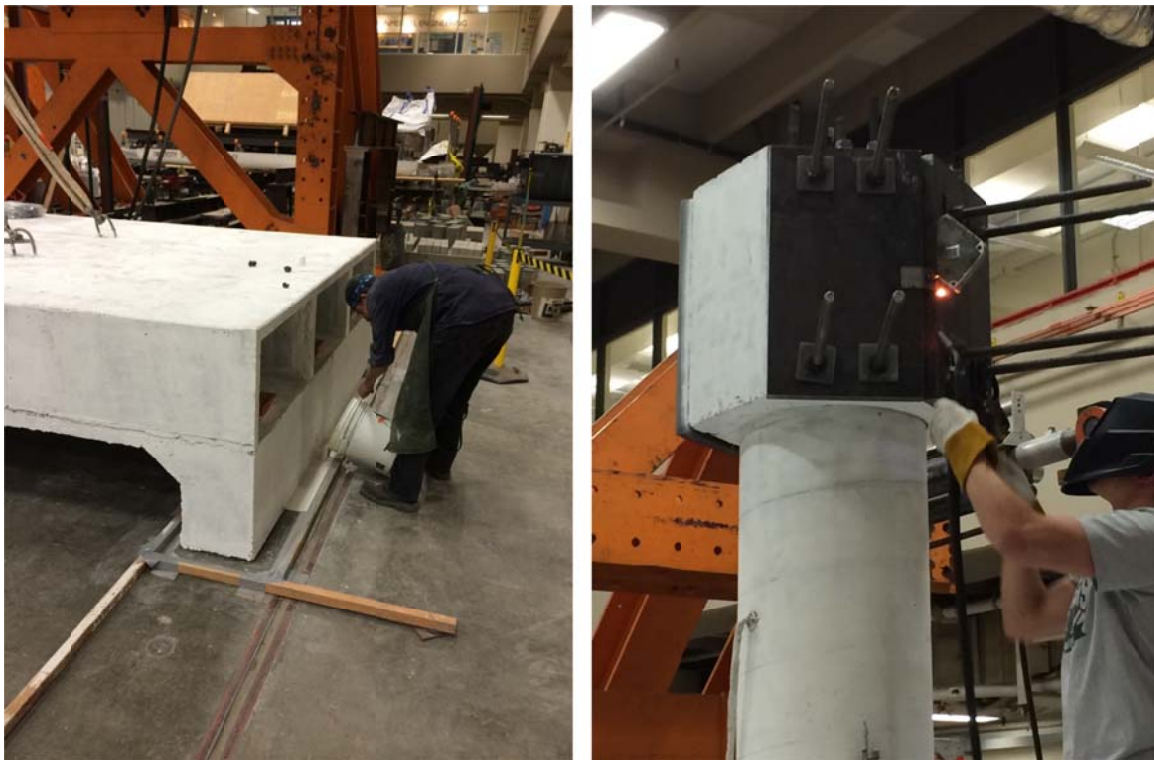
Hydrostoning the specimens' seat beams to the rigid floor (left); and installing the column head plates and instrumentation target eyebolt (right)
